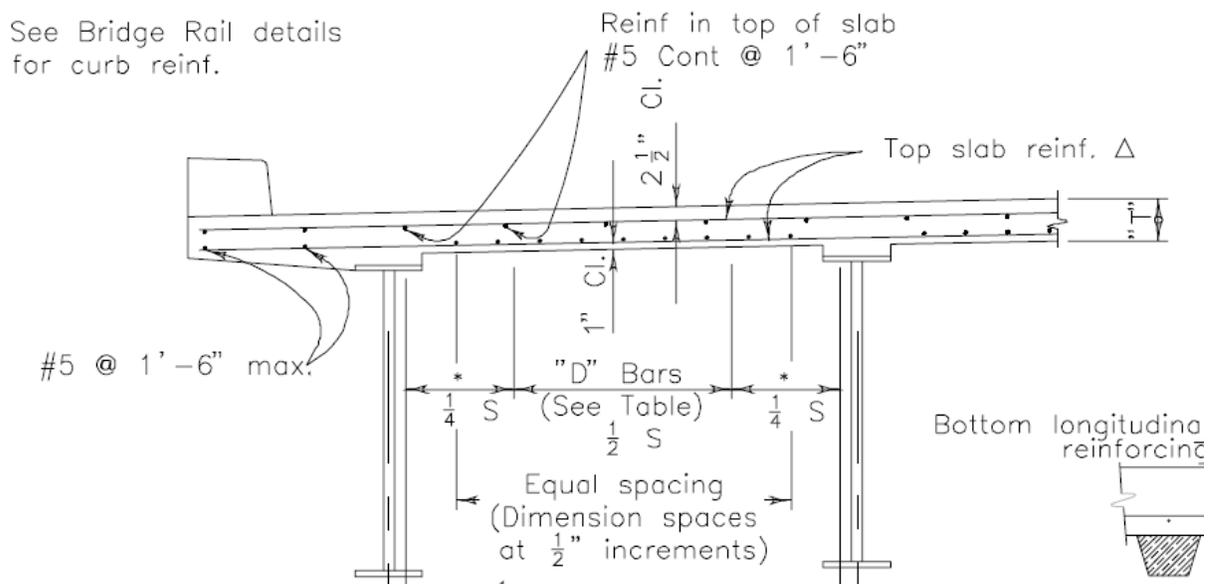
Reinforced Concrete Deck [Bridge 2009]
